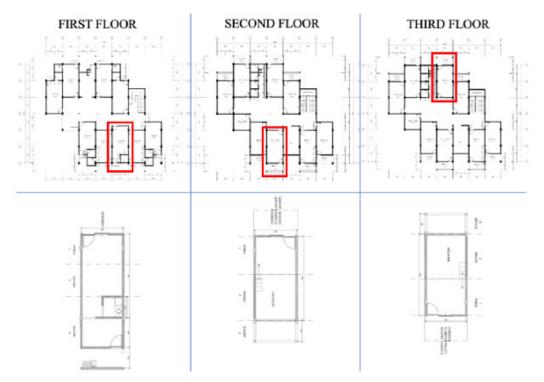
Layout Plans and Units on First, Second, and Third Floor (Source: Aryani, 2022)
